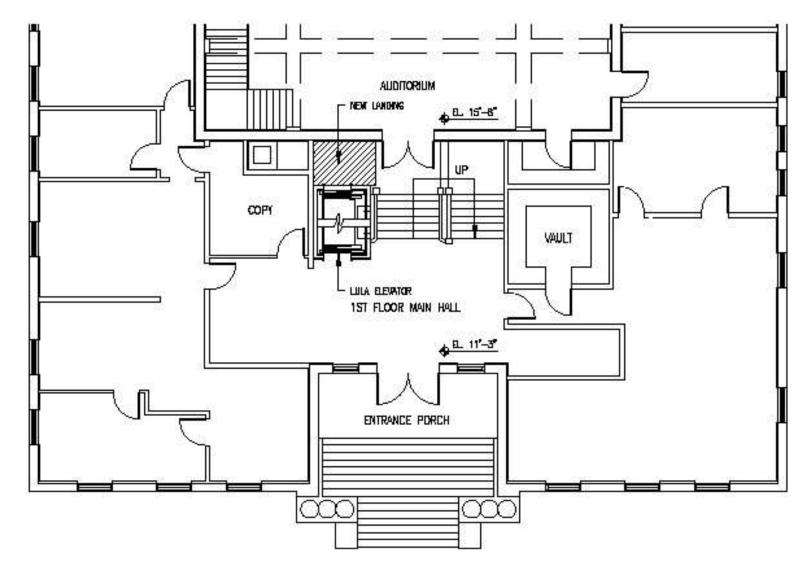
LULA Elevator 1<sup>st</sup> Floor / Auditorium Plan
